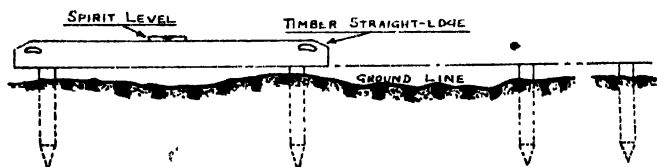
PEGGING OUT LEVELS FOR EXCAVATION
